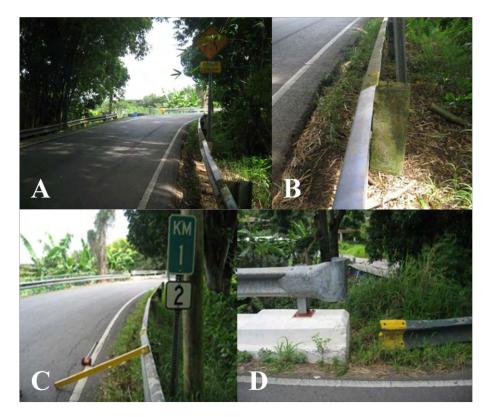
Issues Encountered on Bridge #465 Eastbound Approach
